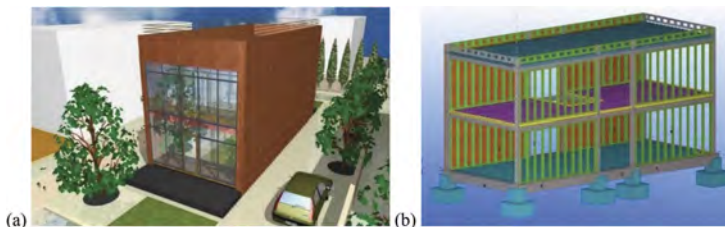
3D view of the house: (a) architectural layout; (b) structural layout.
